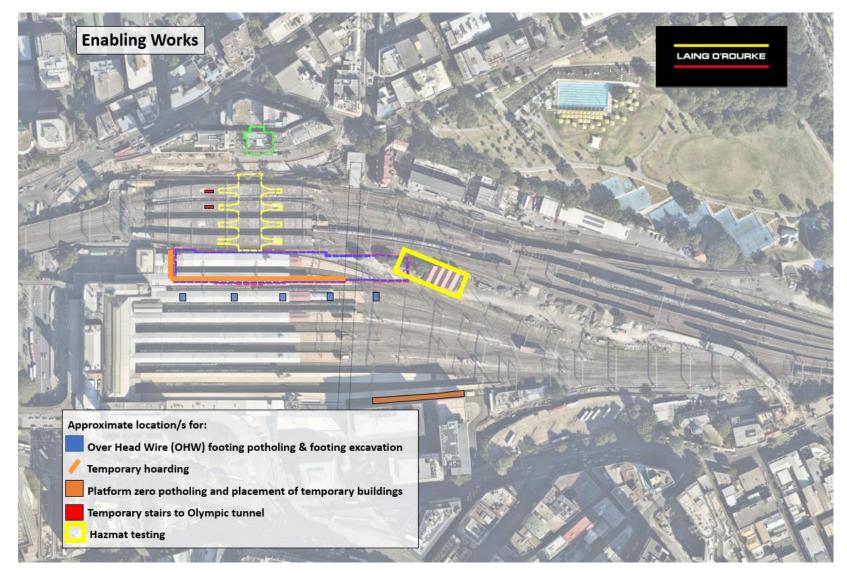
Proposed location of works (Source: Laing O'Rourke).
